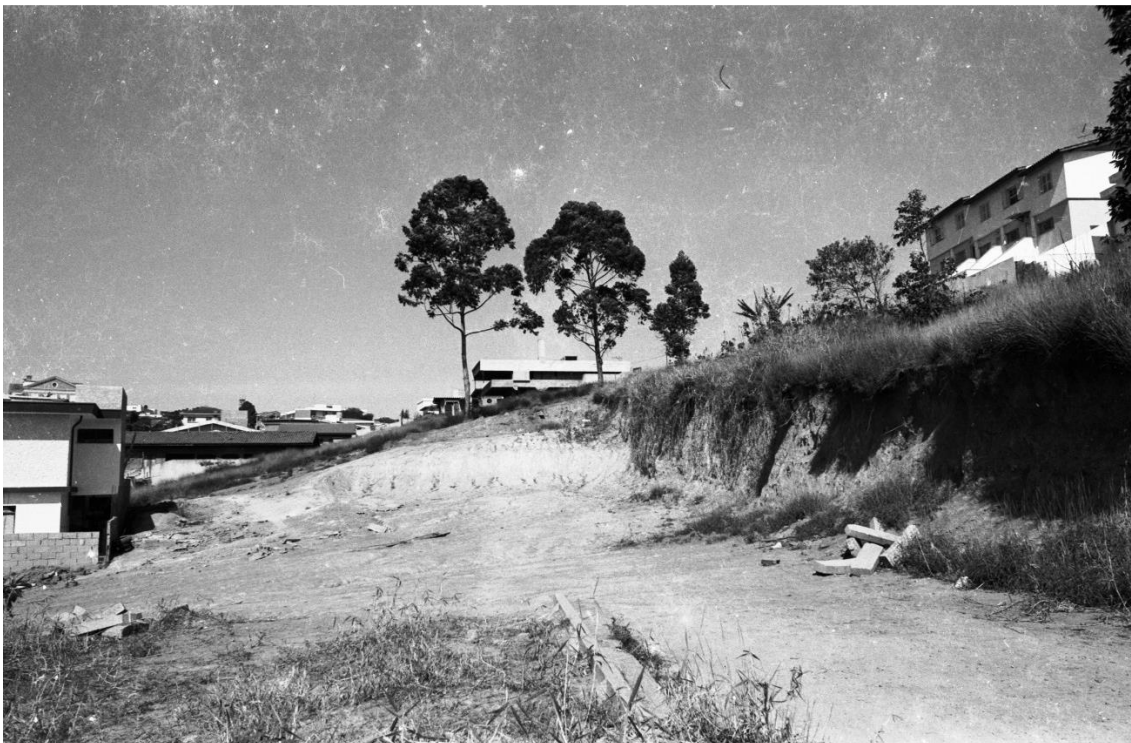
Construction works at Janne Ottoni residence. Northwest façade. Photography by David Ottoni, c.1973.
